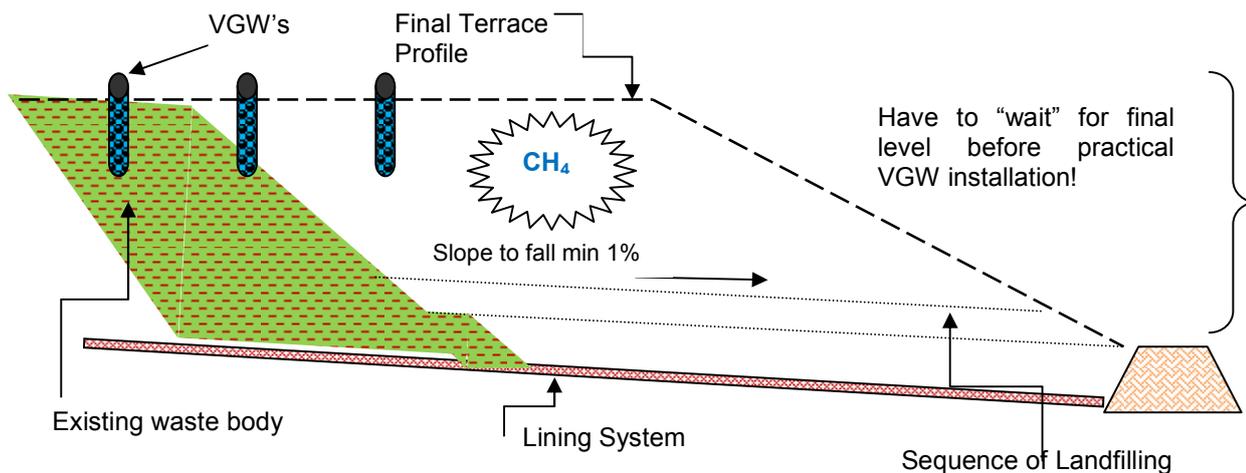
Typical Section through Landfill illustrating VGW installation - NTS
